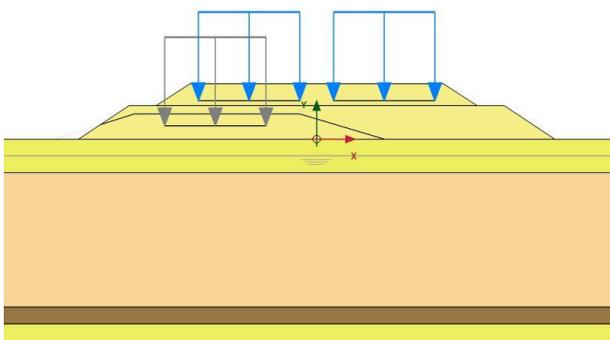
FEM model for B section without soil improvement: the last phase, new-build rail embankment with live loads.
